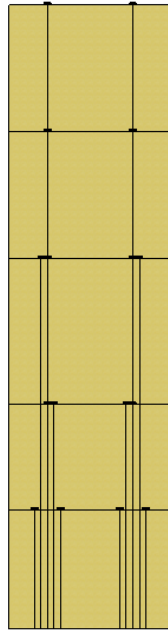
Anchorage of tensile bars over the height of the wall (wall 2/4)
